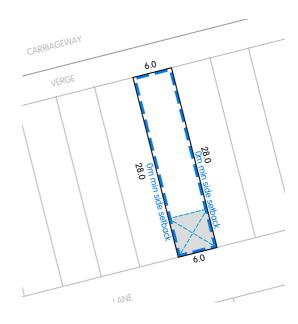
| Clarkefield Township Zone - Main Street Character Area: Building Envelope 01 (Rear loaded, under 300m2)
